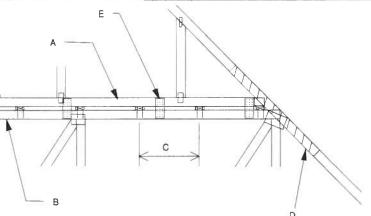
DETAIL IS NOT APPLICABLE FOR TRUSSES TRANSFERING DRAG LOADS (SHEAR TRUSSES). ADDITIONAL CONSIDERATIONS BY BUILDING ENGINEER/DESIGNER ARE REQUIRED.
